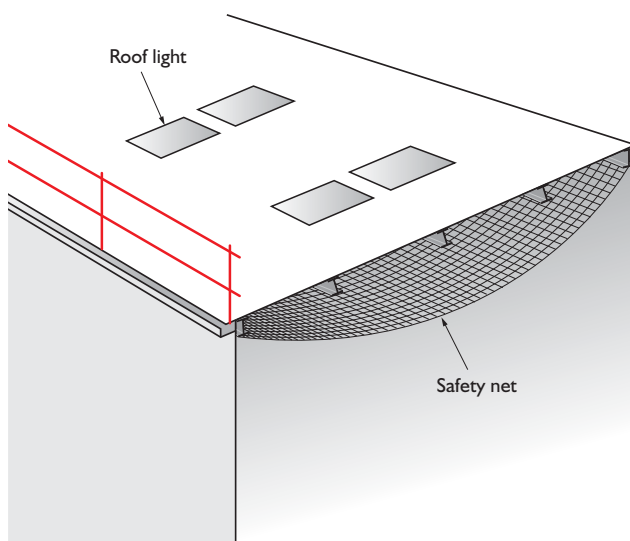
Fall arrest netting rigged to protect against falls through a fragile roof light.
